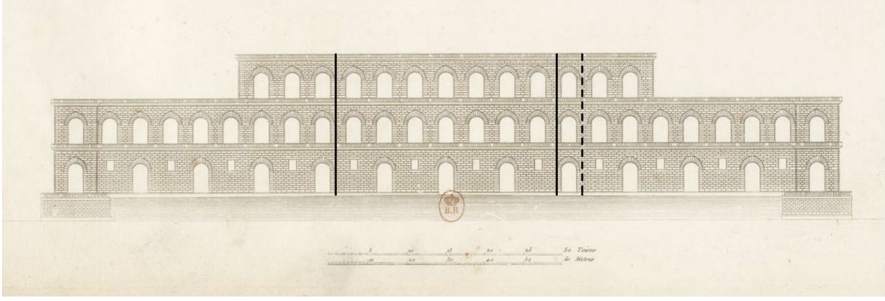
Palazzo Pitti with highlights of the original 7-bay façade. Image: Grandjean and Favini 1806, pl 3
